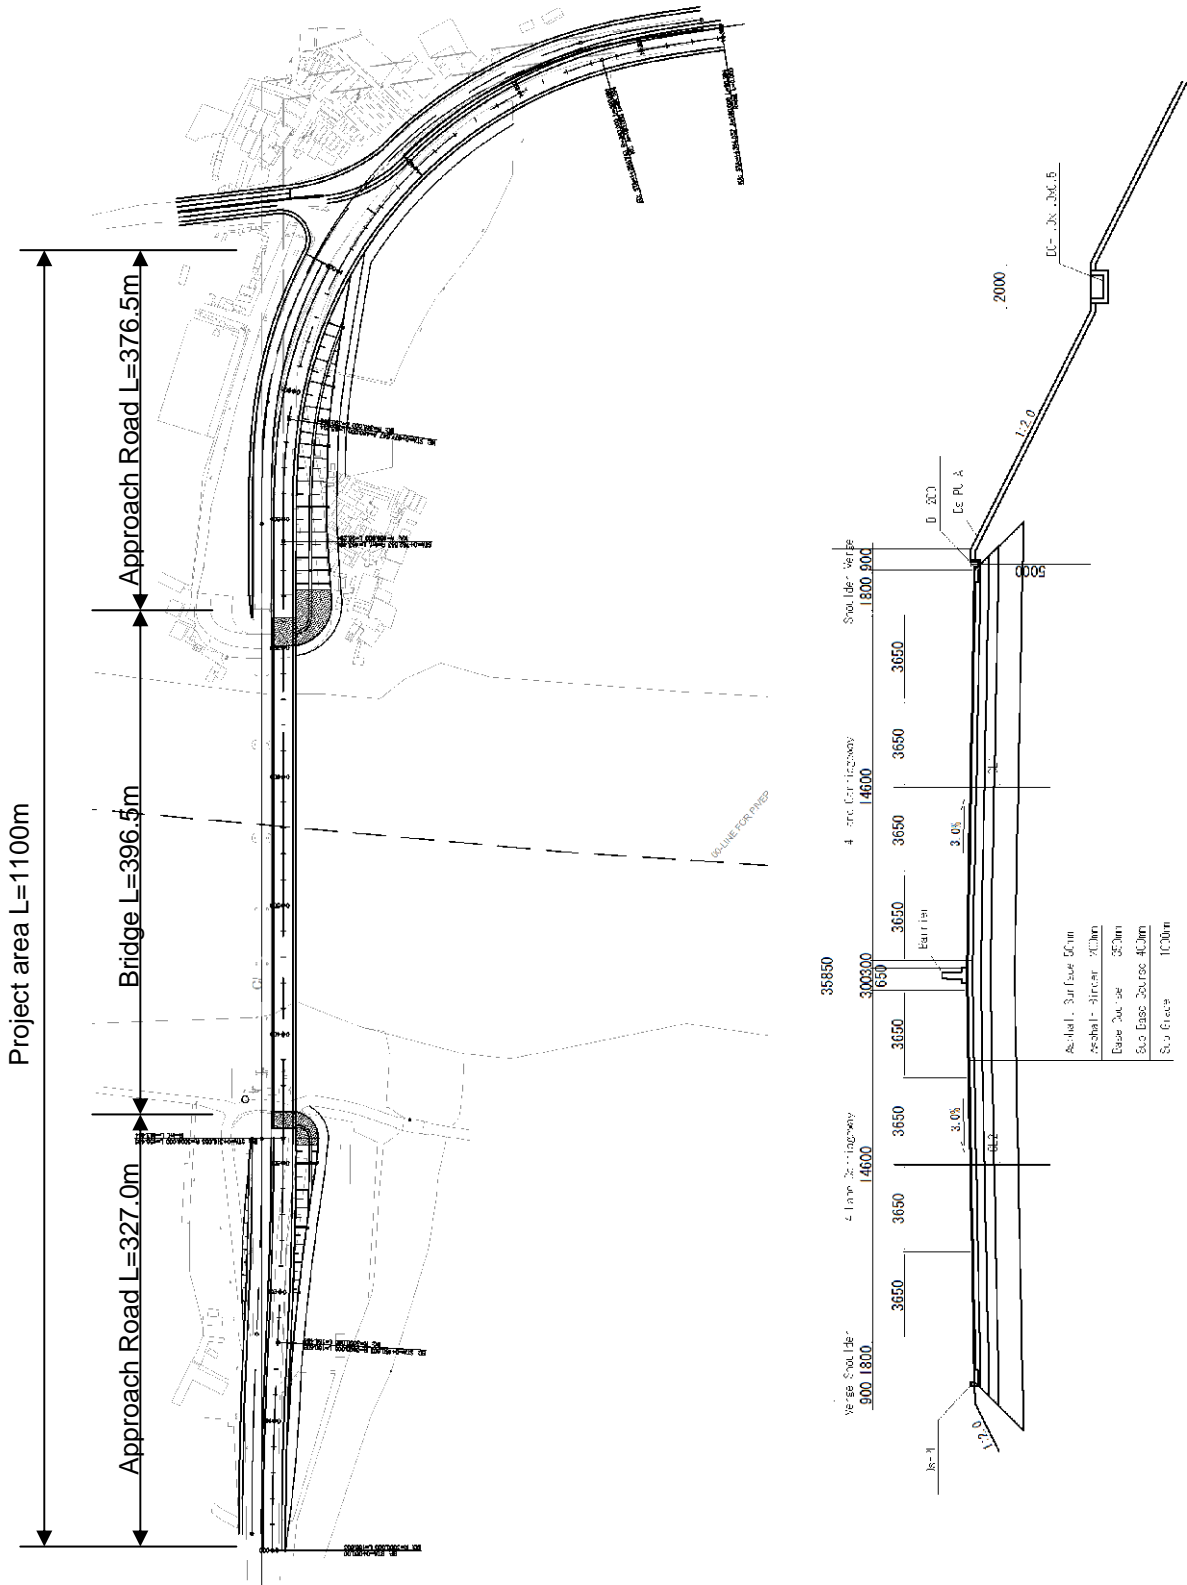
Plan and Typical Cross Section at Kanchpur
